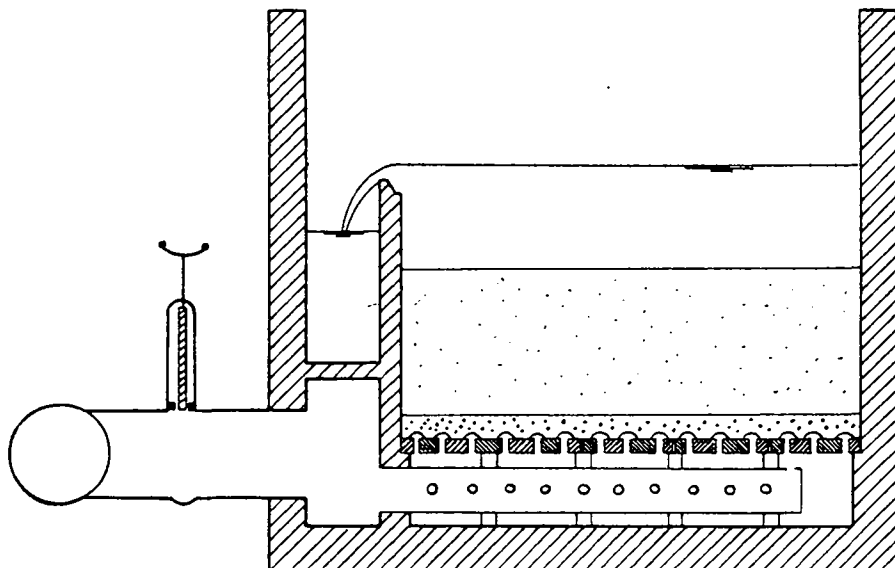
False bottom and strainer underdrainage system for backwashing with water.
